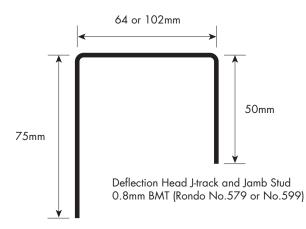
Shaft Wall Framing Components Deflection Head J-Track and Jamb Stud
